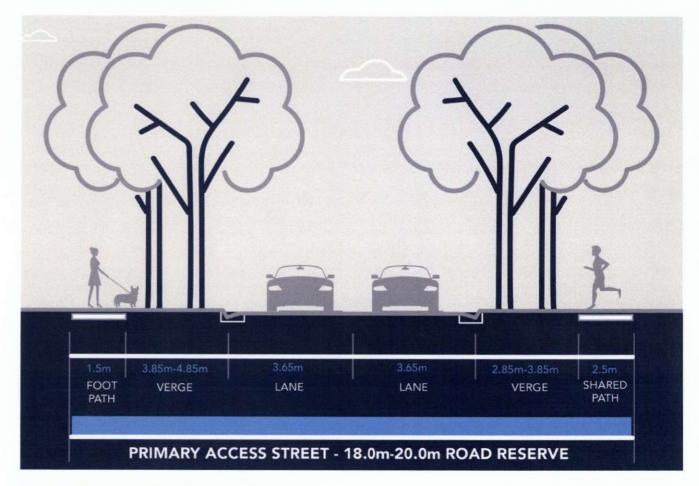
Primary Access Street / Feature Landscape Street Cross Section
